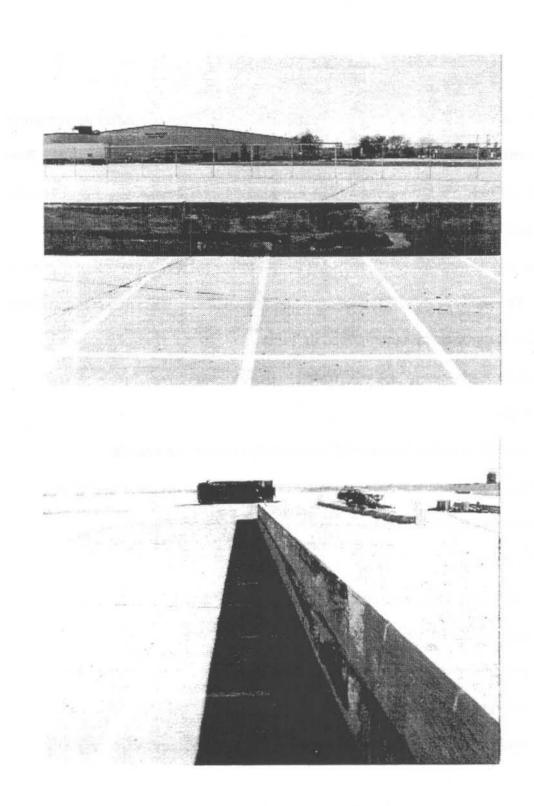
Retrofit Concrete Barrier damage, Test I4-2.
